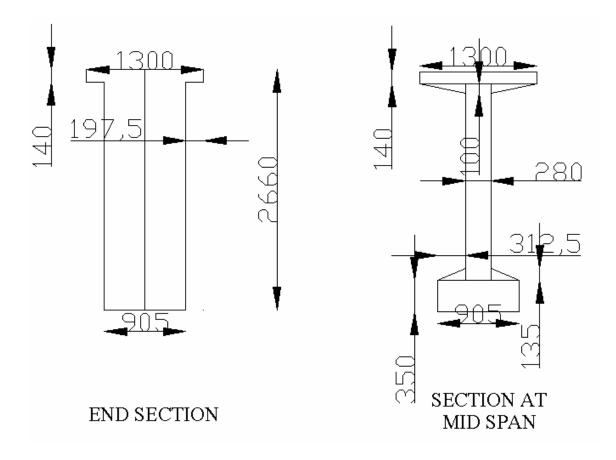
Cross section of I girder in transverse direction (all dimensions are in mm)
